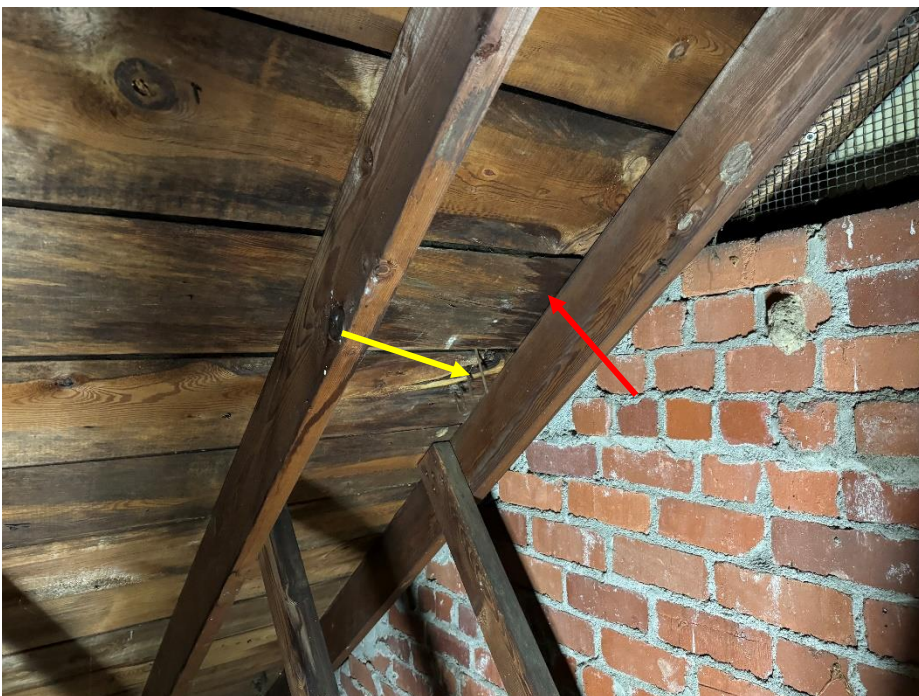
Bldg. 403 – Unit 1427: Red arrow pointing to crack in roof sheathing.
